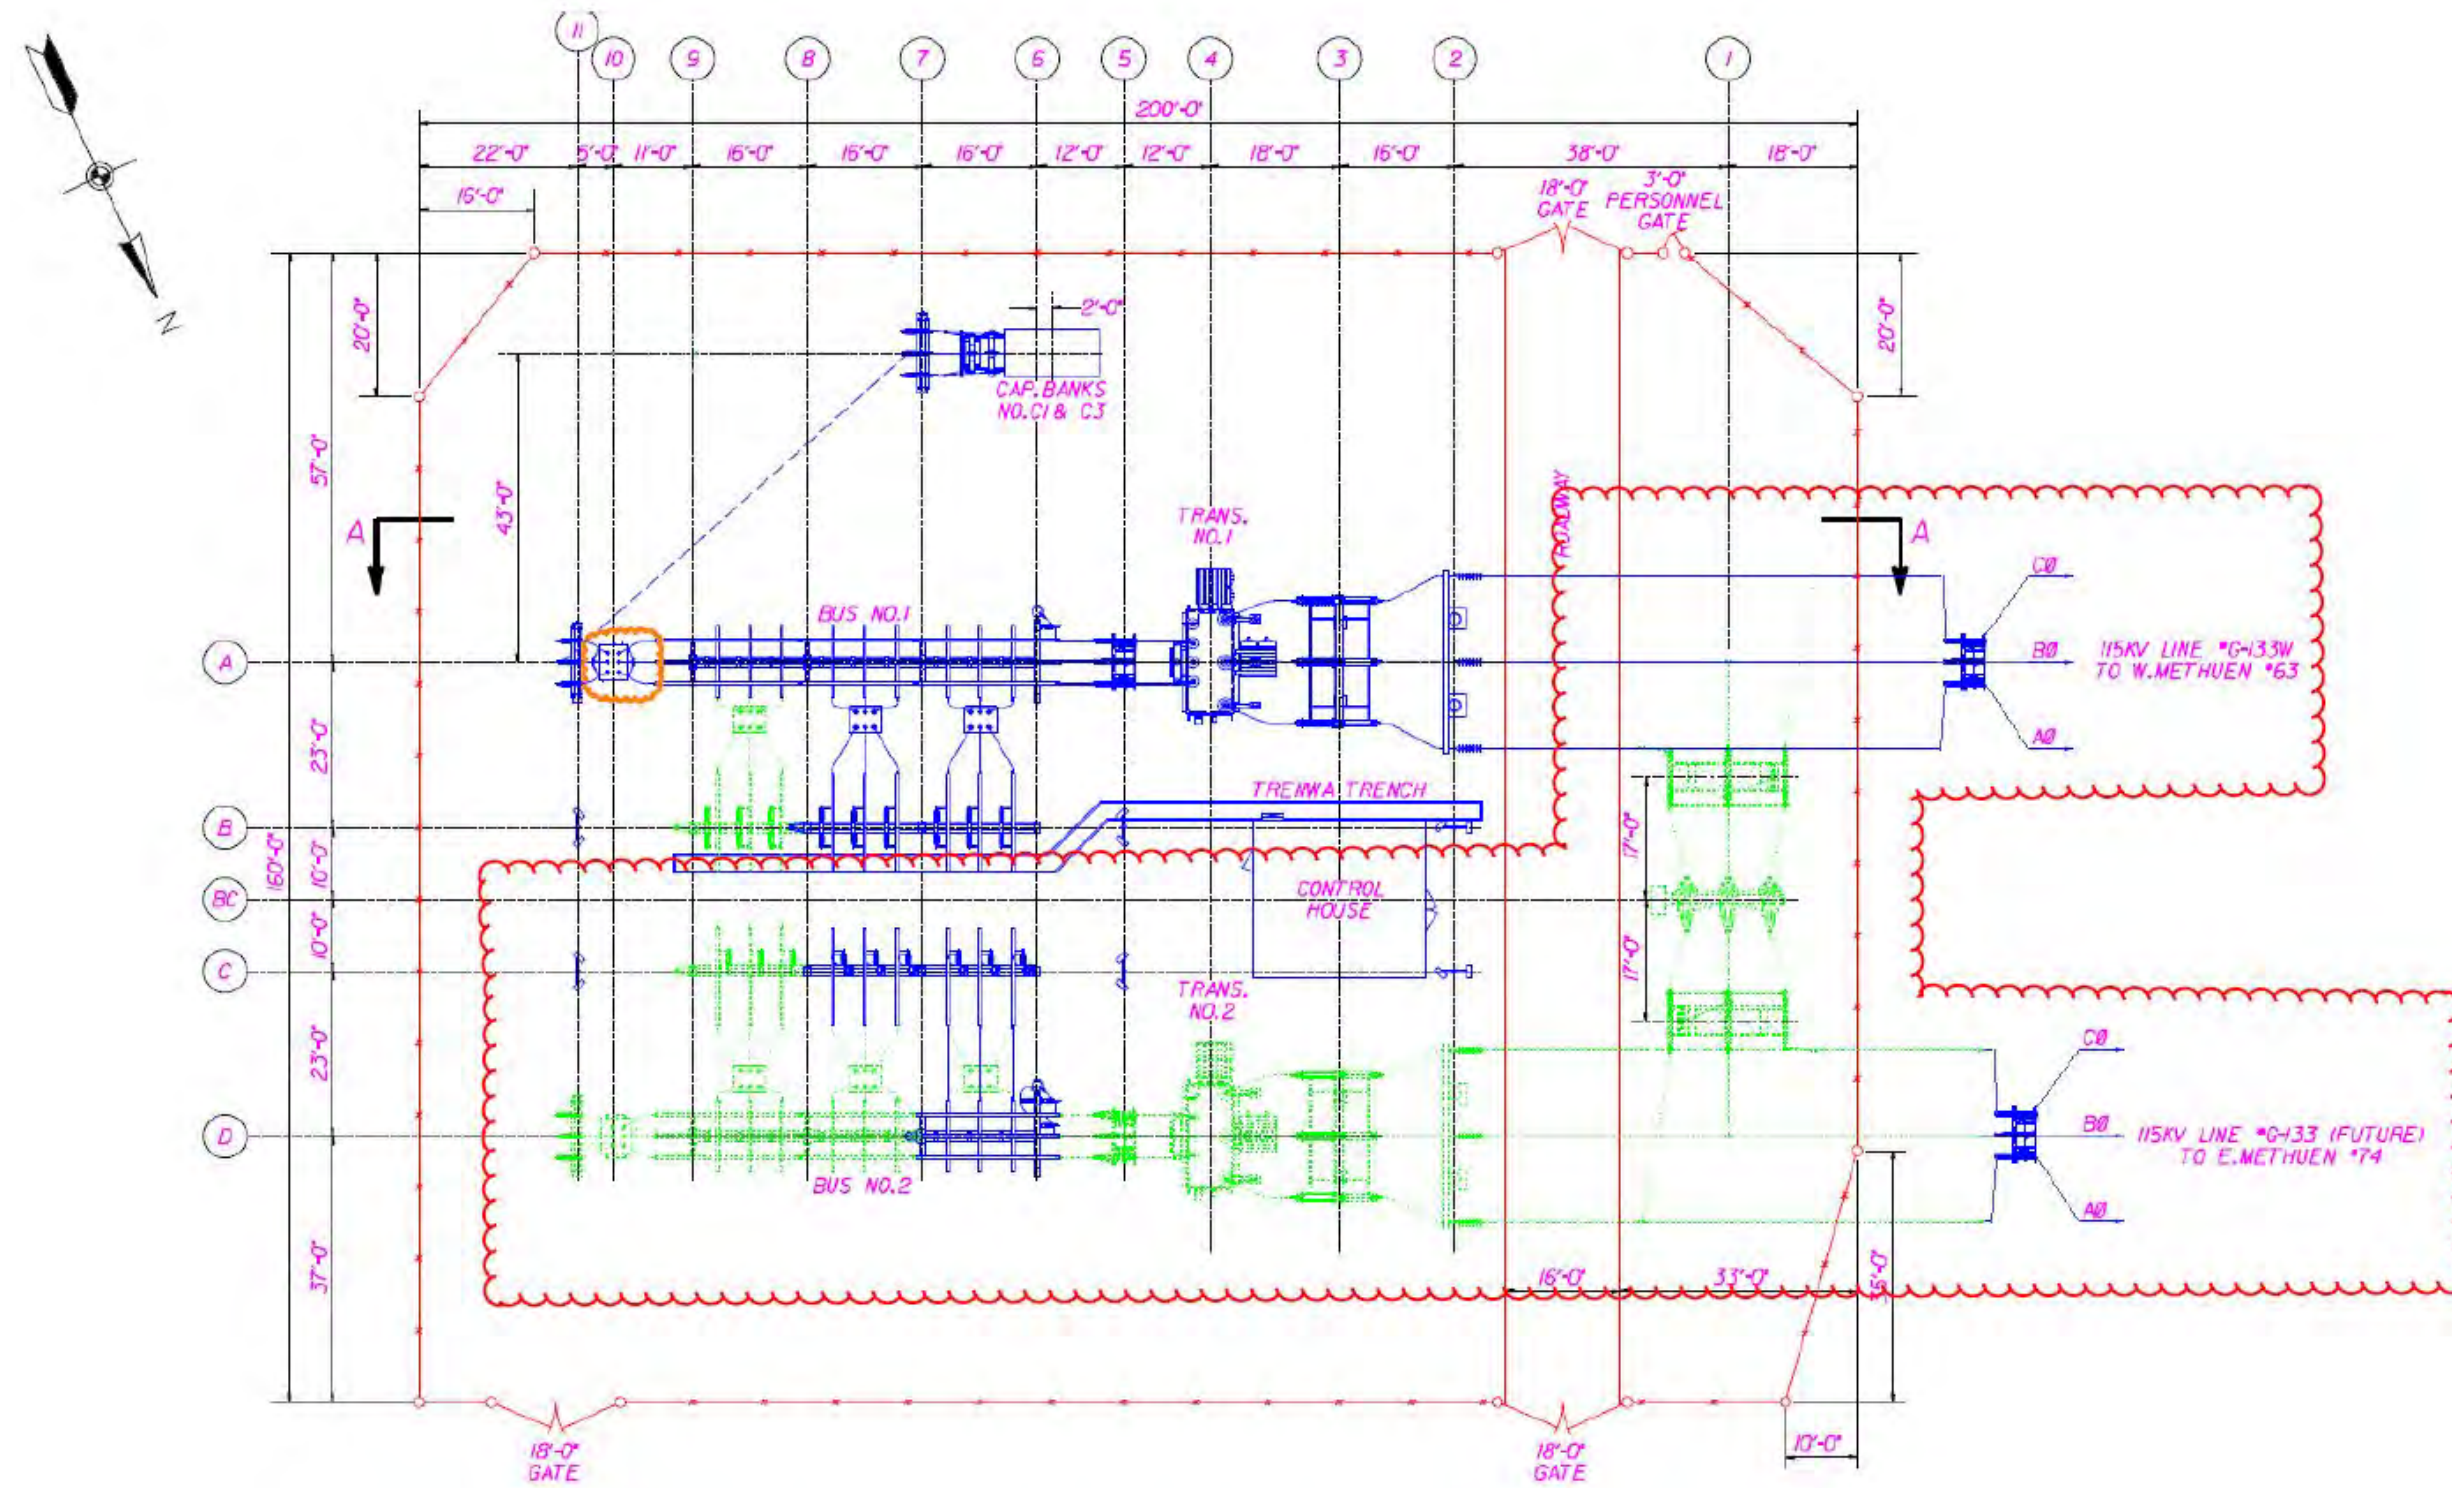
Alternate Plan Five Phase One Golden Rock Station Proposed Layout
